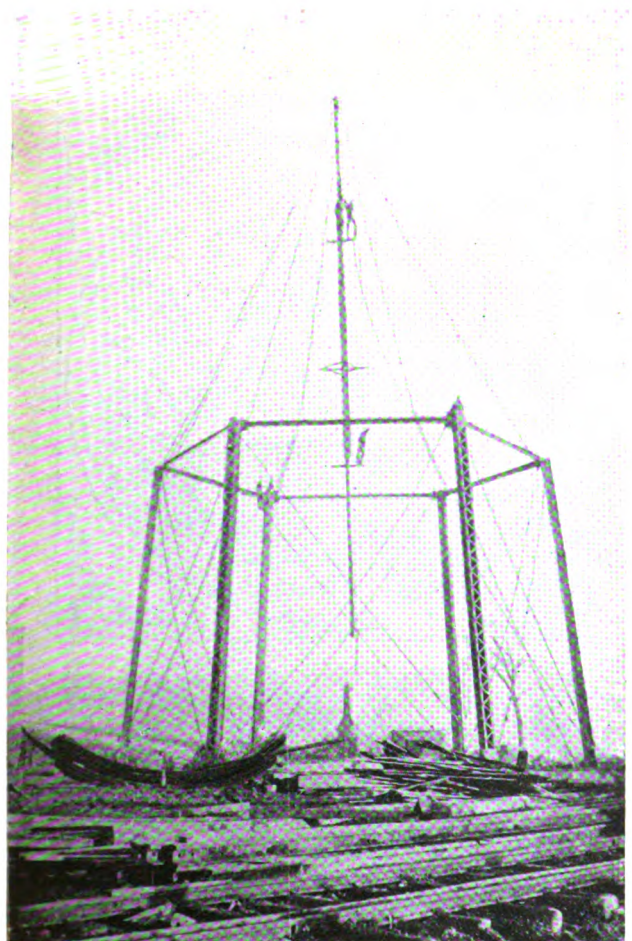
FLOATING JIB FOR ERECTING STEELWORK.
